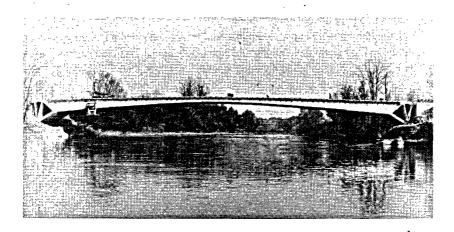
Prestressed concrete bridge over the River Marne at Esbly, France.
